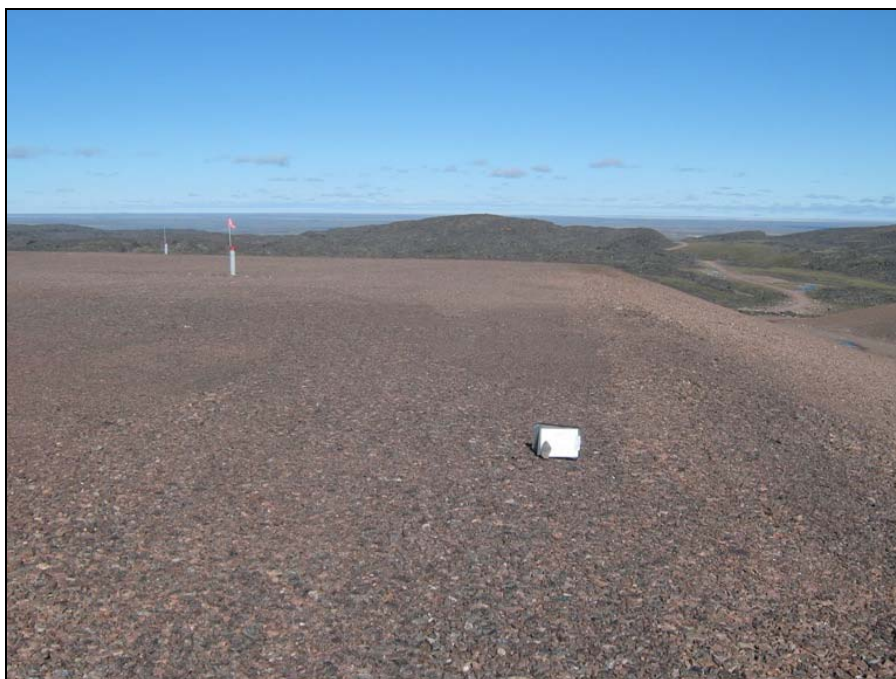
South slope from southeast toe facing west. Some seepage from south slope and minor ponding at toe. No staining. ↑
